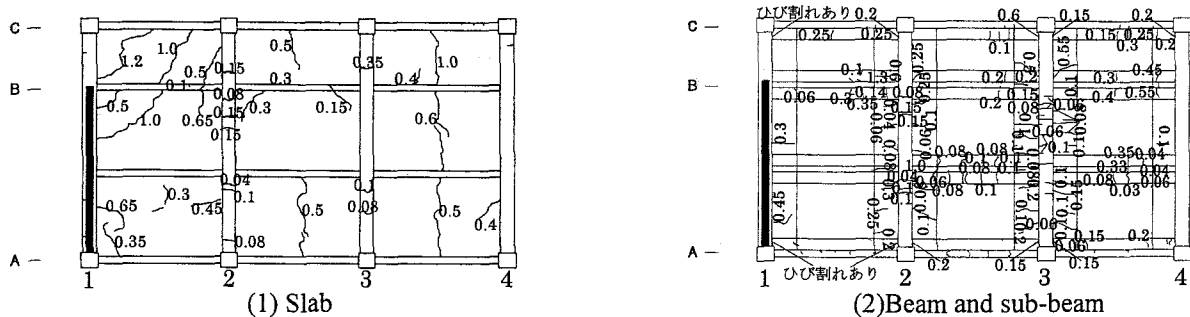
Concrete crack conditions in hydro-mechanics laboratory of each ceiling surface
